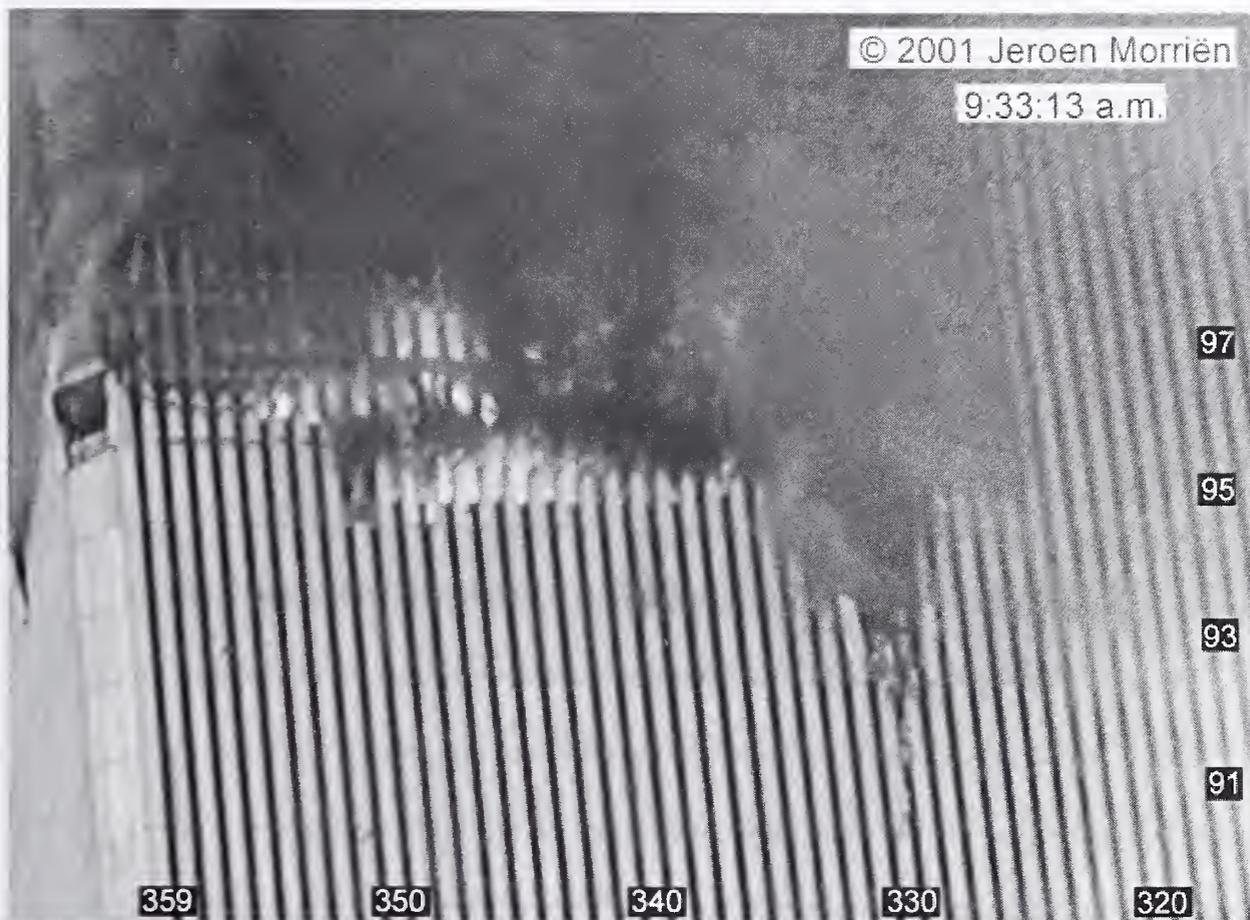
This cropped image shows a portion of the south face of WTC 1 at 9:33:13 a.m. The photograph has been enhanced, and column and floor numbers have been added.
